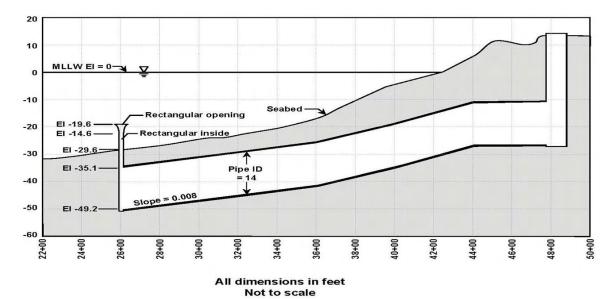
TYPICAL POWER PLANT OUTFALL CONFIGURATION
